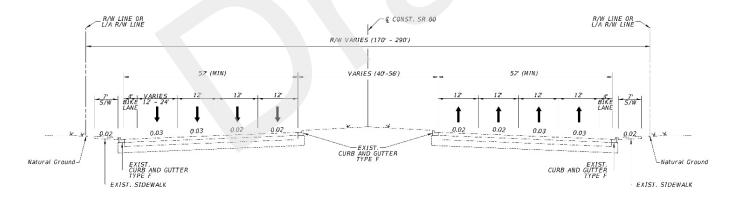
Existing Typical Section – SR 80, west of I-95
